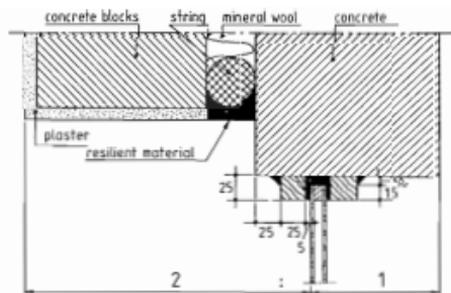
Mounting of the test specimen on the staggered opening, following DIN 52 210 (dimensions in mm)
